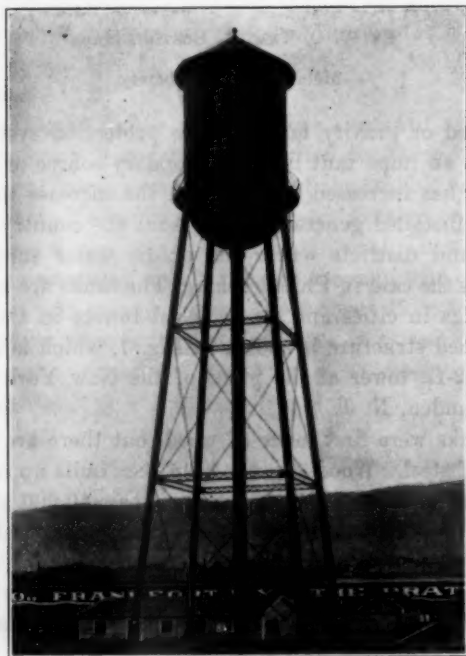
TYPICAL DETACHED TOWER STRUCTURE FOR ELEVATED TANK. CAPACITY 150,000 GAL.; ELEVATION 242 FT. TO BOTTOM OF TANK
